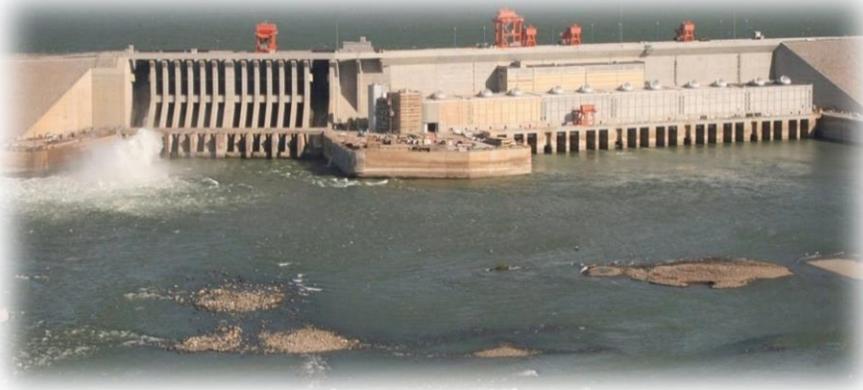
, DCUAP- Down Stream Power Station Concreting.
